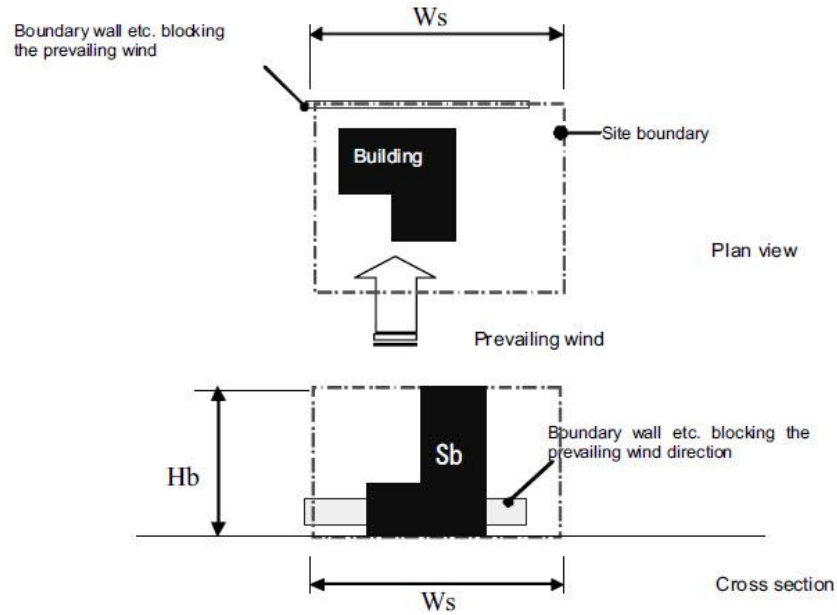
Calculation Procedures for the Building Elevation Area Ratio (JaGBC, 2008)
